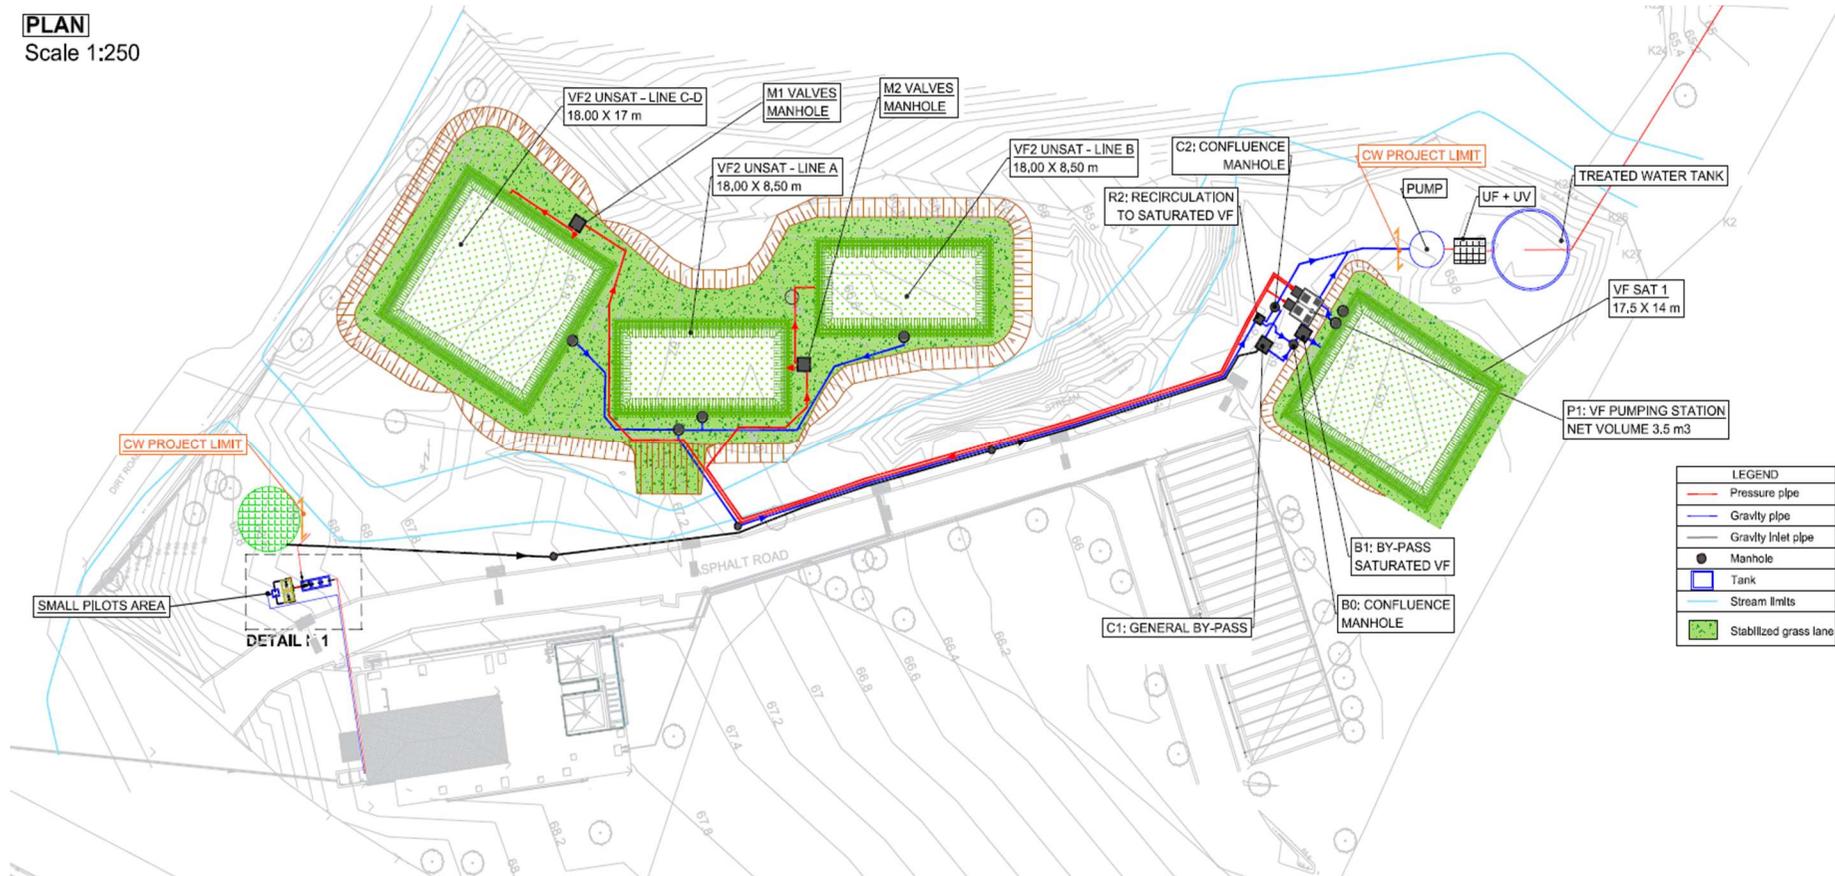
Plan layout of Lesvos full-scale system – final detailed design
